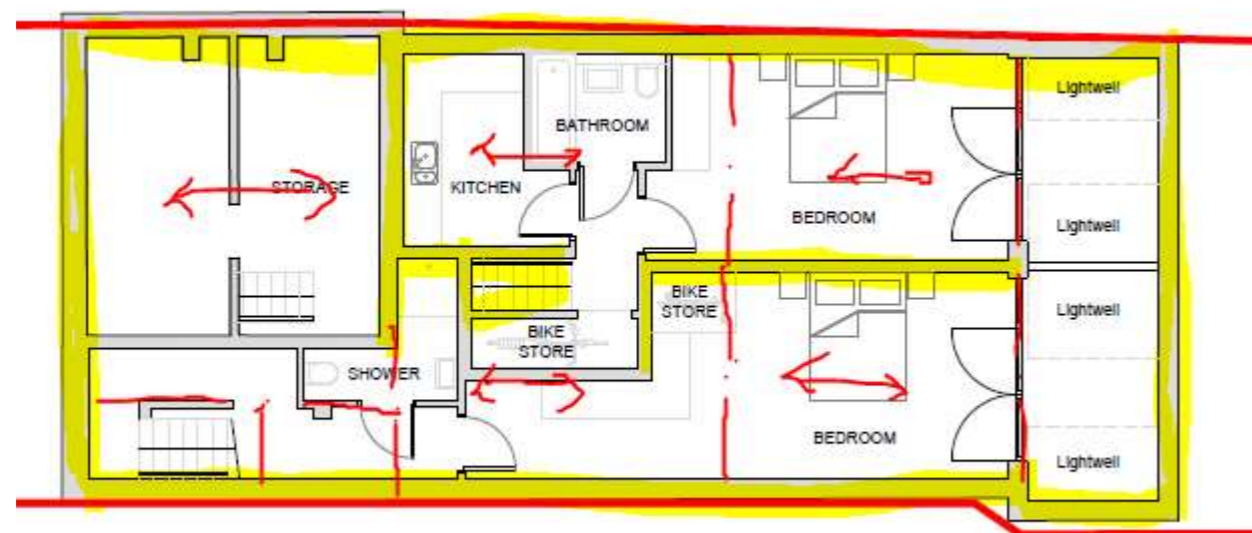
Assumed basement showing span of ground floor over and steel beam over
